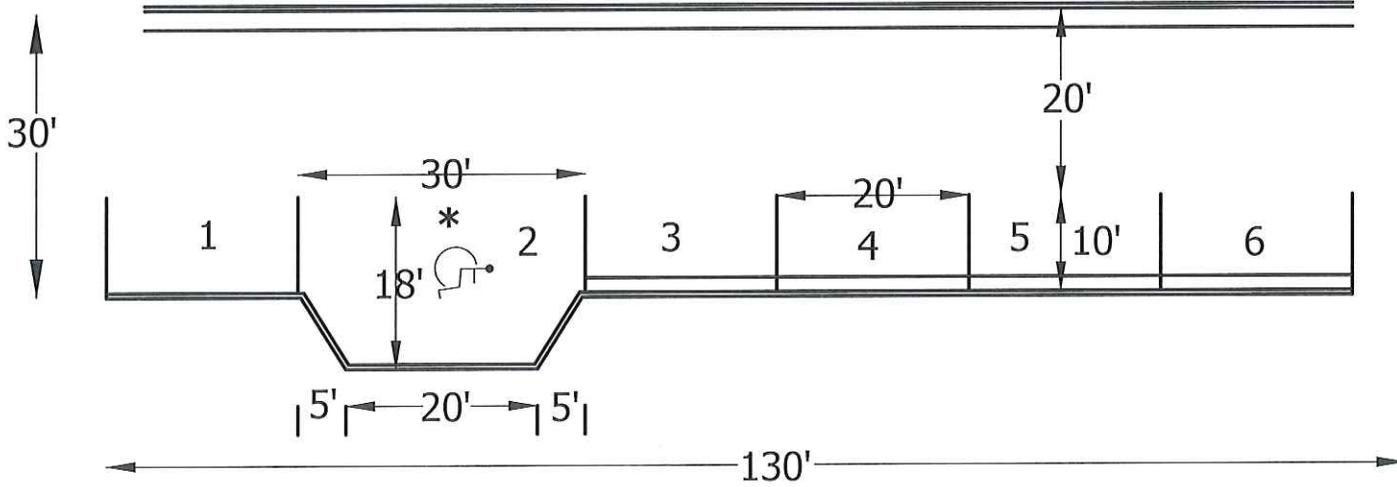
A parking lot with six (6) parallel parking spaces if exempt from the Parking Lot Landscaping Requirements.
